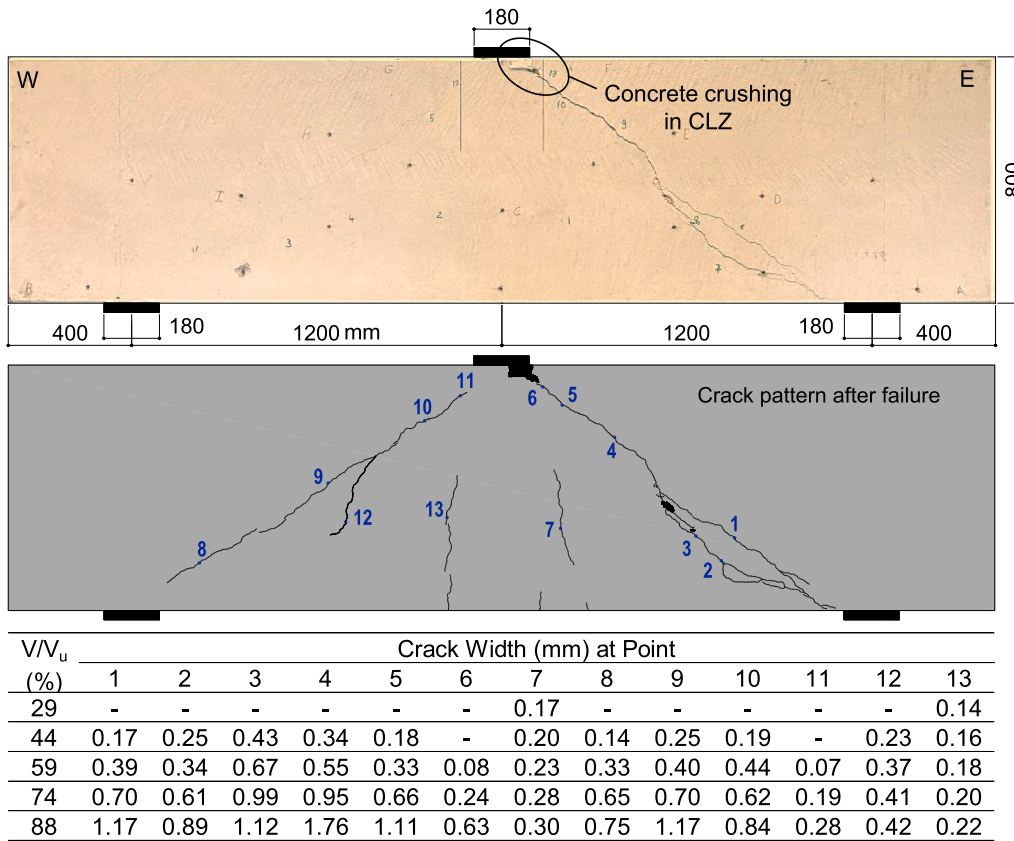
Photograph and crack pattern at failure of specimen P8.
